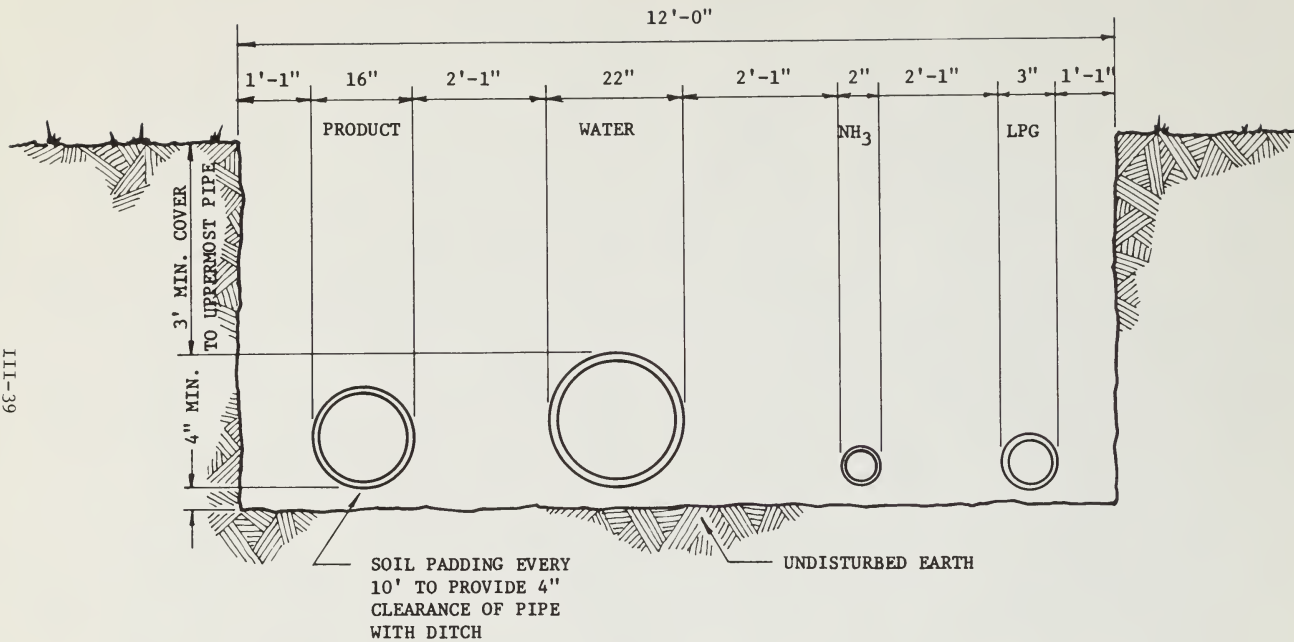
TYPICAL MULTI-PIPELINE DITCH DIMENSION
